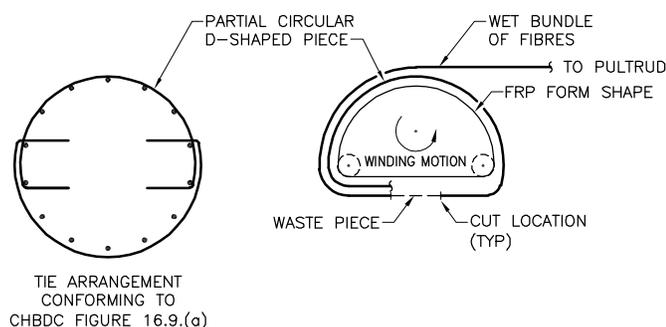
Example of Winding Process for Partial Circular D-Shaped Pieces
